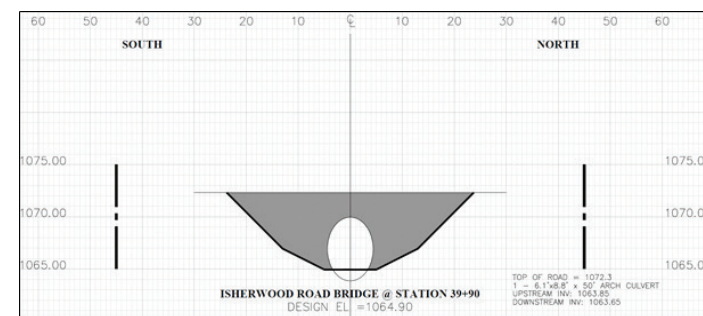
Cross sectional view of the Isherwood Road culvert (PCDD, 2002)
